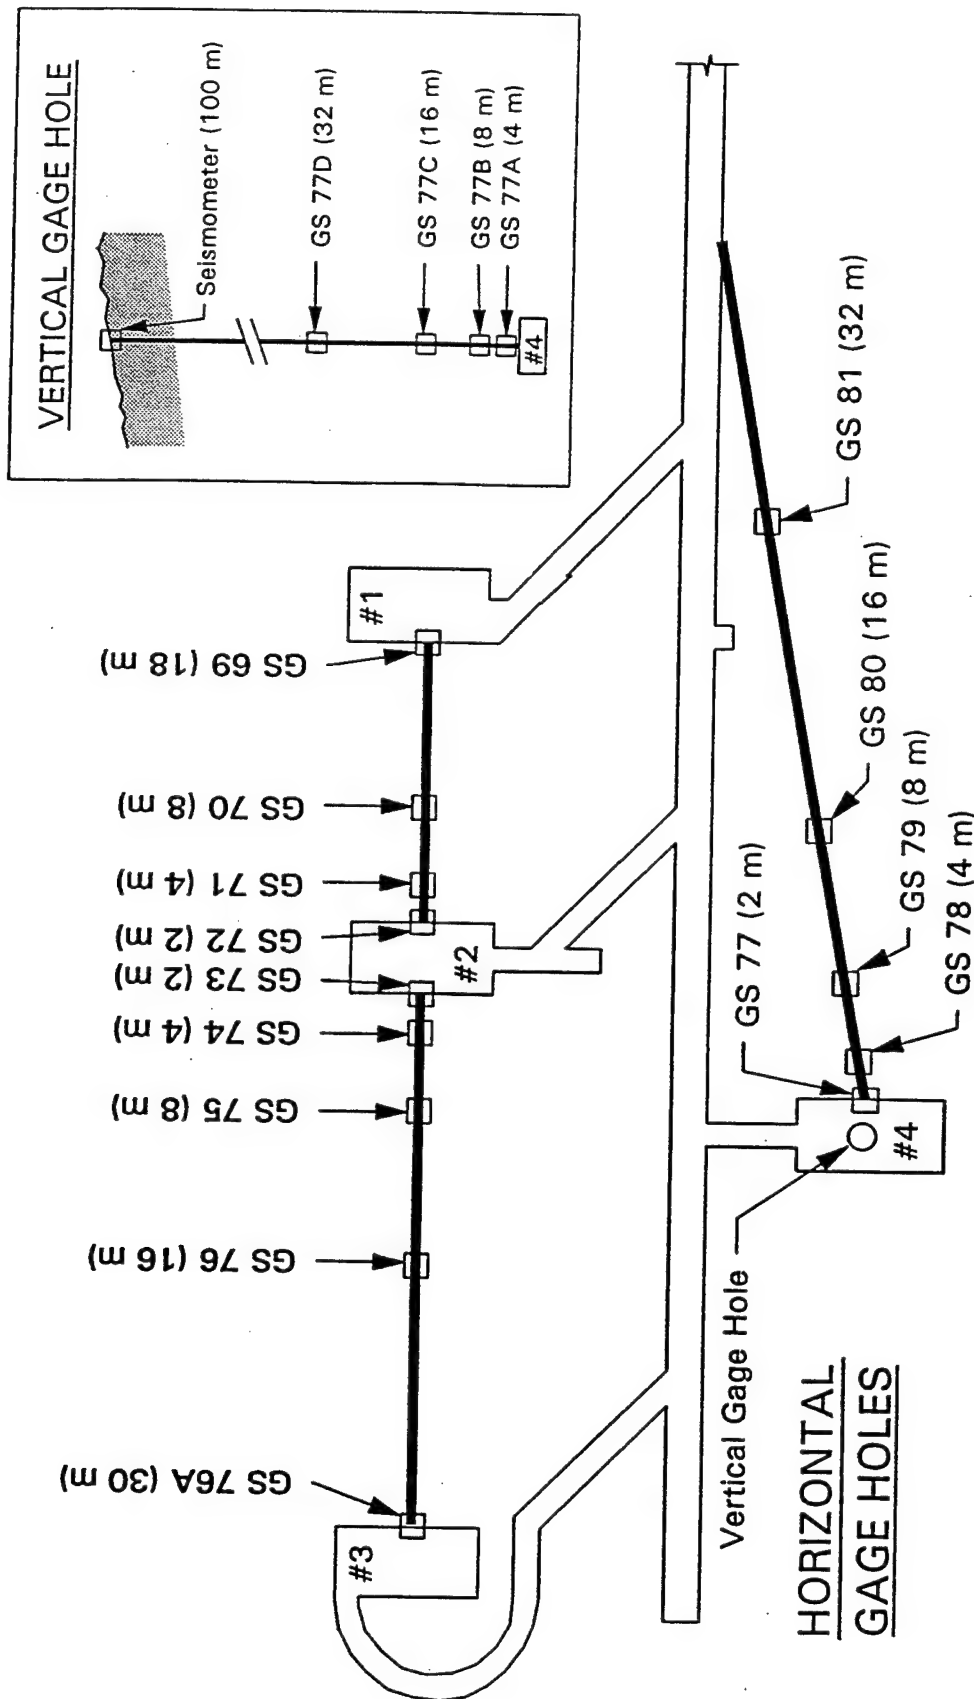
Ground shock instrumentation layout for U.S. intermediate-scale tests. All gage holes were 200 mm in diameter and stemmed with rock matching grout. Gage distances (in parentheses) are measured from center of test chambers.
